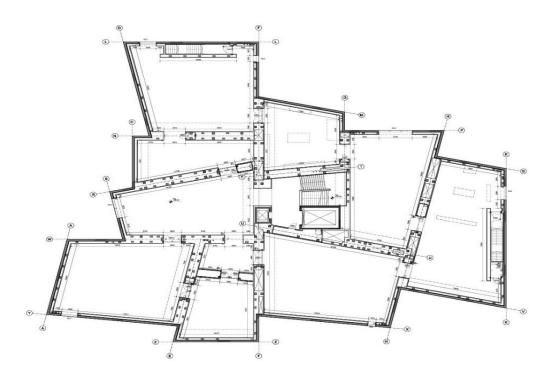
First Floor plan of The Hepworth Gallery
